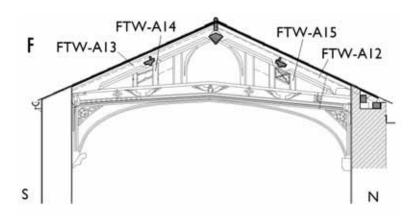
East elevation of principal truss 7 (based on truss 11), showing the location of samples FTW-A12-15 (Freeland Rees Roberts Architects)
